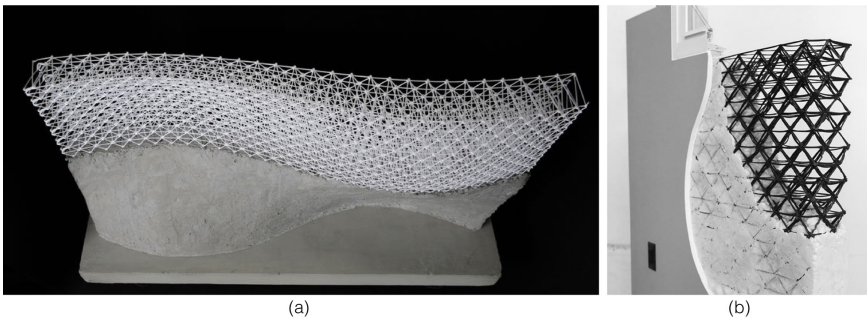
Robotically printed plastic meshes used as leaking formwork: (a) MeshMould concrete wall prototype; (b) Branch Technologies wall section with insulation (photo credit: (a) Gramazio Kohler Research; (b) Branch Technology).
